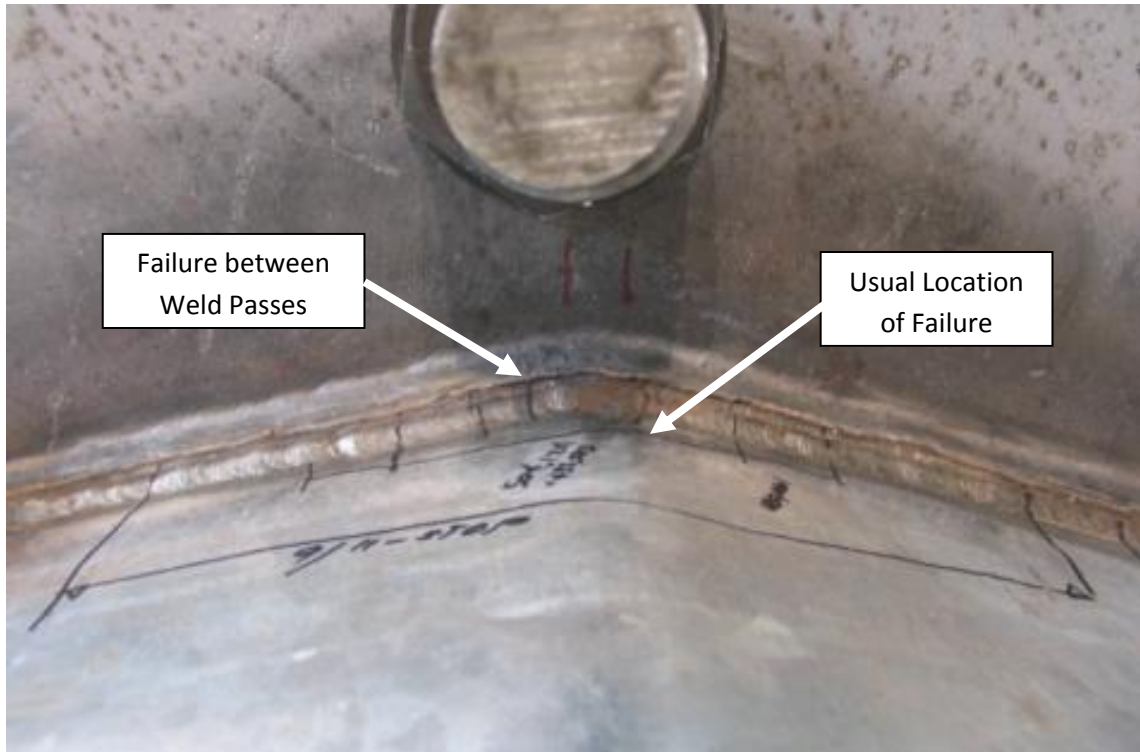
Bend 11 of Specimen Field Repair with Failure through Weld
